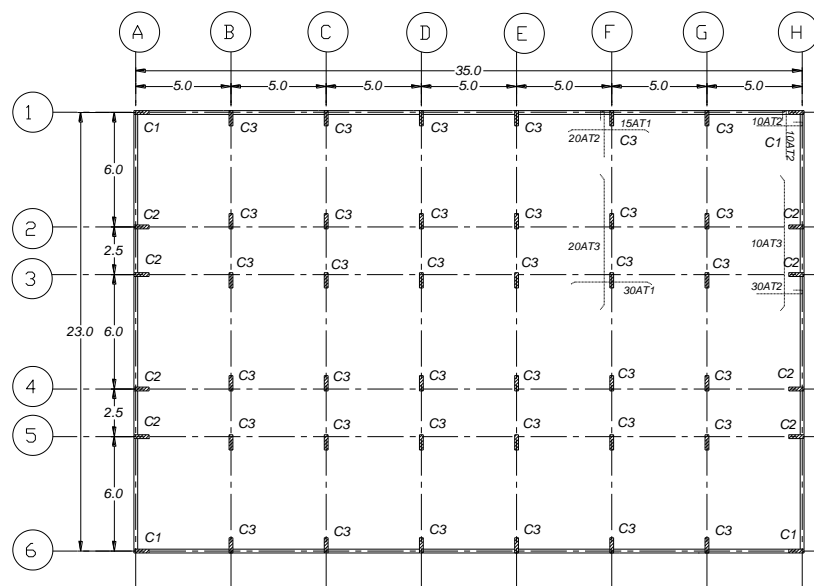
Typical reinforcement details for the floor slabs of the police station
